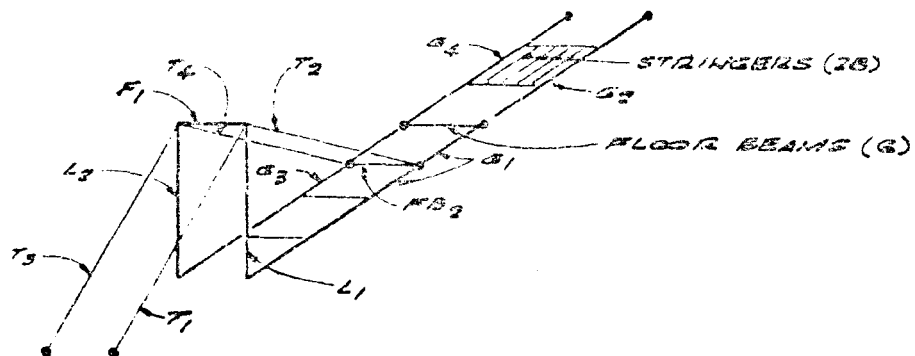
BRIDGE CONCEPT NO. 4: BRIDLE BRIDGE
